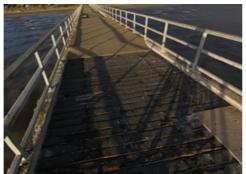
Test portion of concrete decking removed showing original decking, 2018. Source: Google Street View, December 2021
